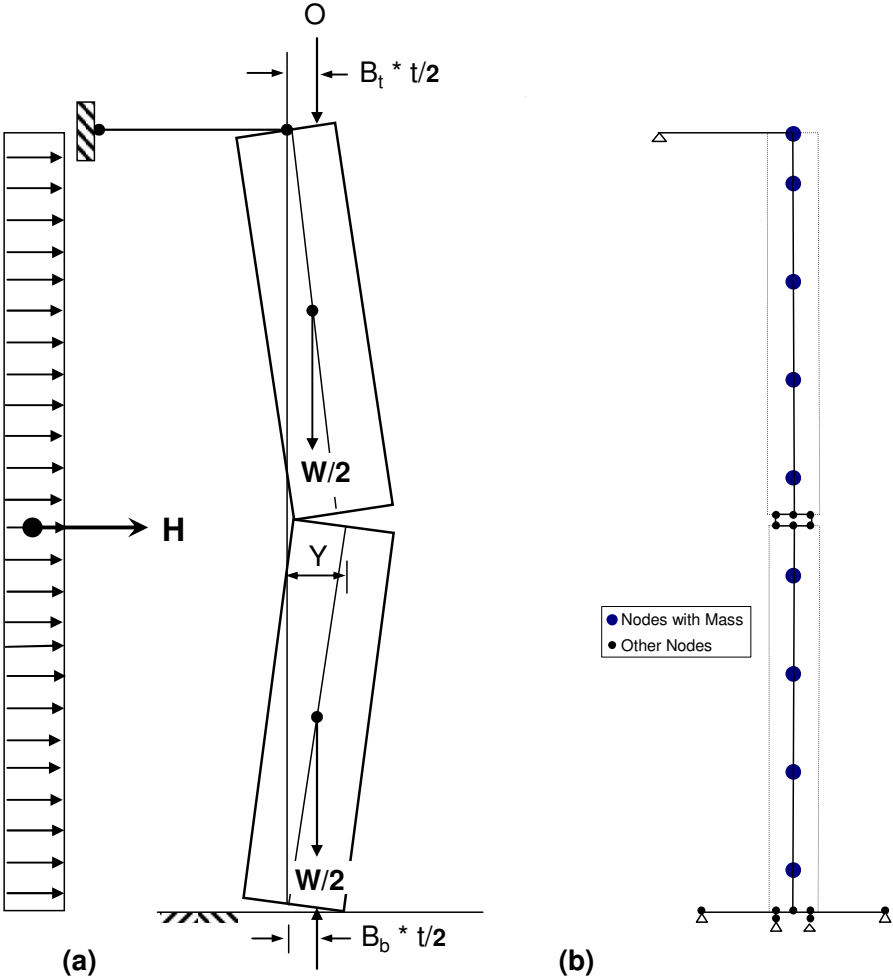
(a) Behaviour of Face Loaded Single-Storey Wall Element under Static Loading and (b) Diagram of the Computer Model used to Analyse a Similar Wall Element ($B_t = 0.0$)
